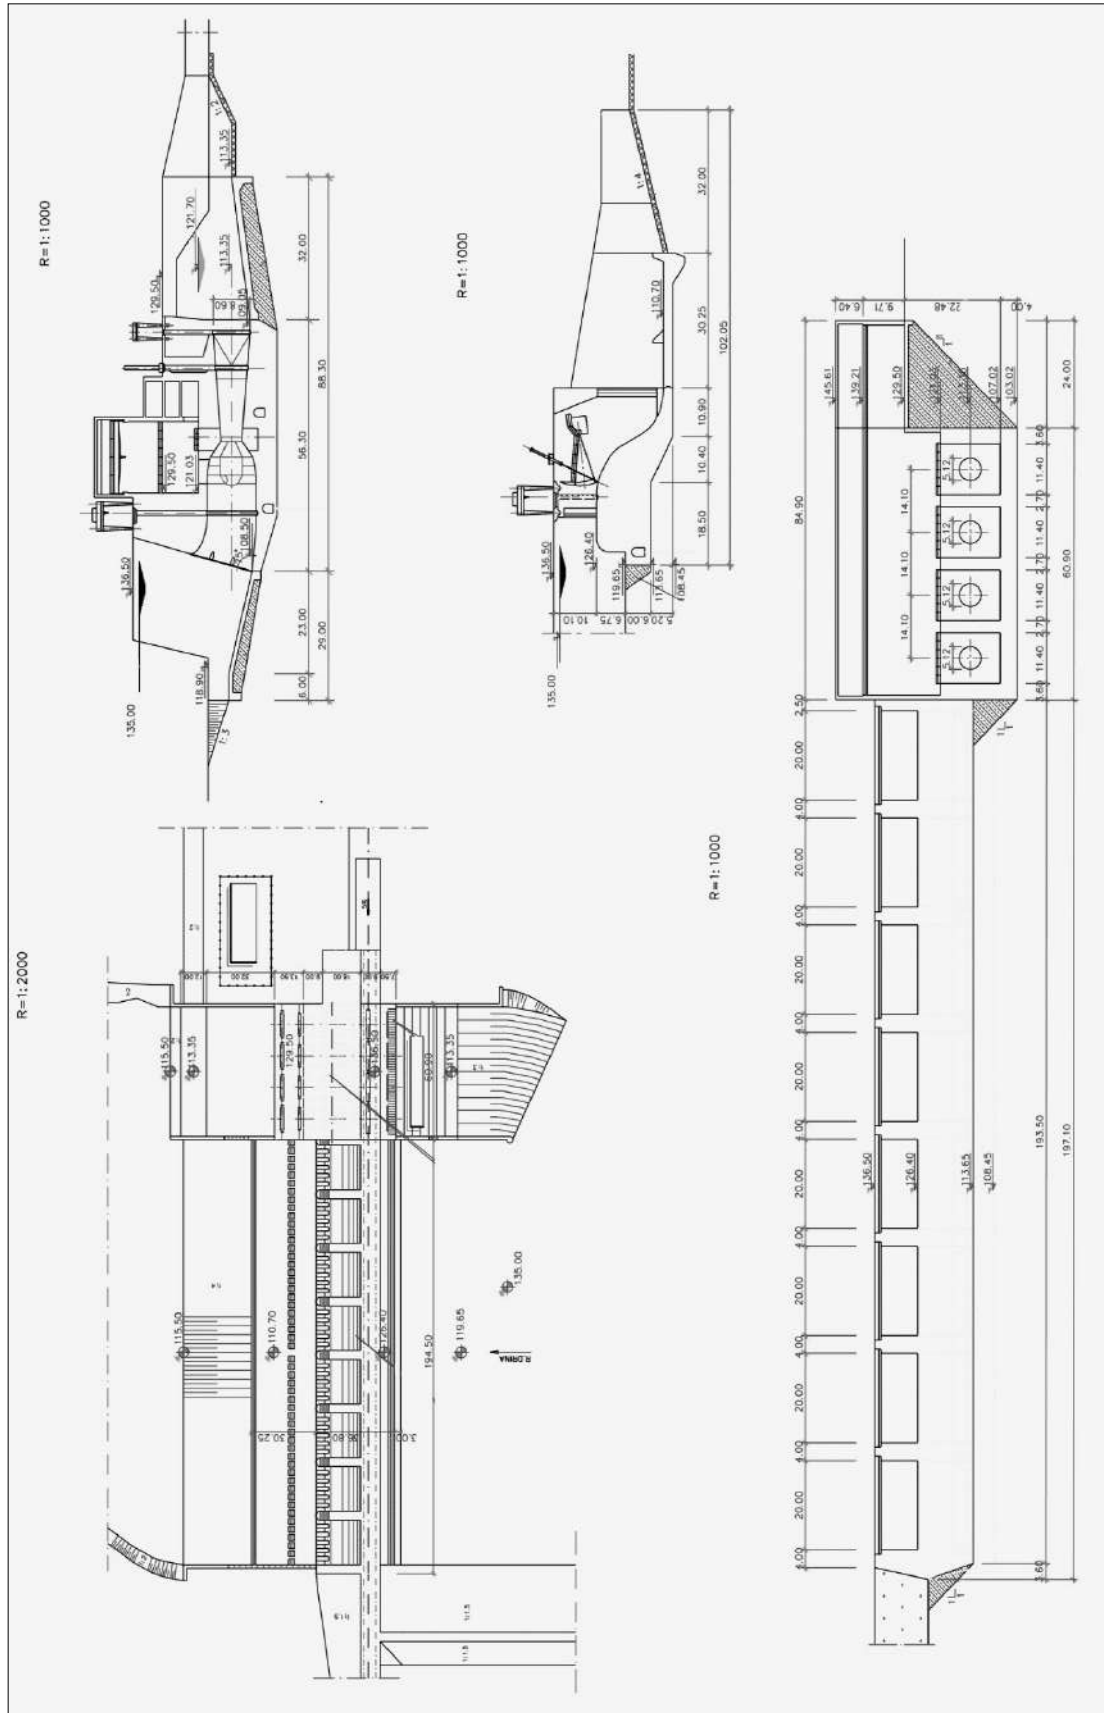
The layout of the dam and HPP Kozluk with cross-sections through the powerhouse, spillway and the concrete dam
